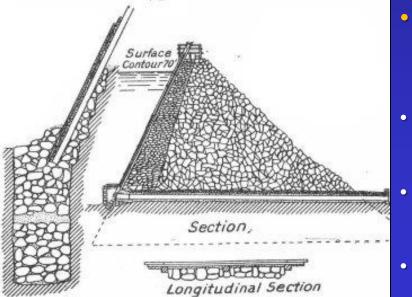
SKETCH OF RECONSTRUCTION OF CHATSWORTH PARK ROCK-FILL DAM.
